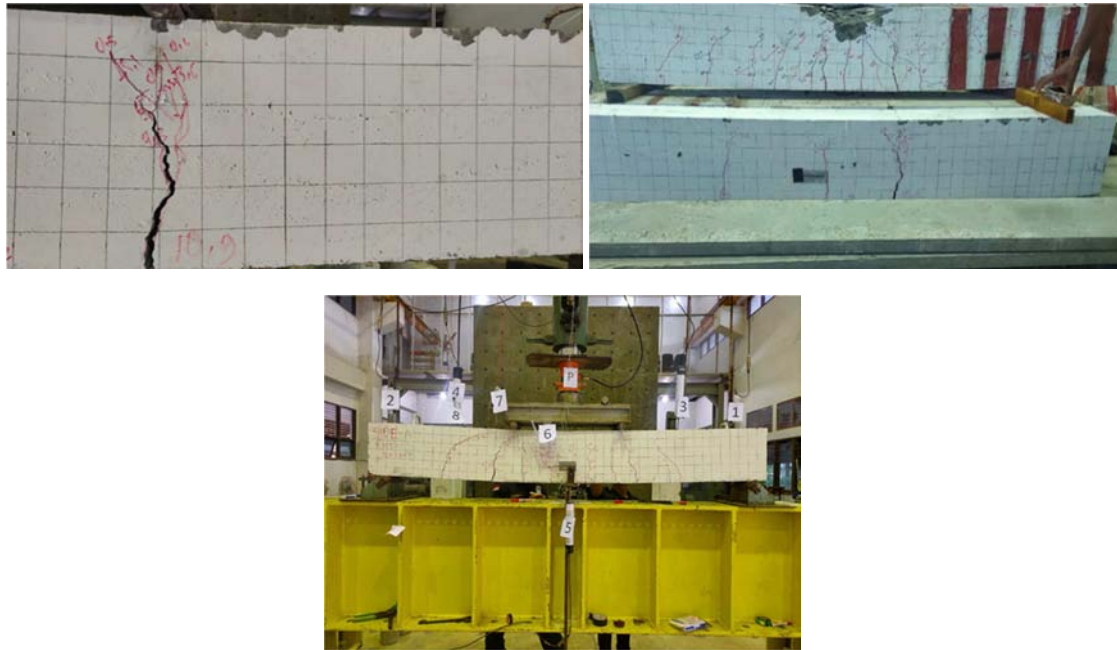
Pattern of Fractured of beams specimen use Bamboo reinforced.
